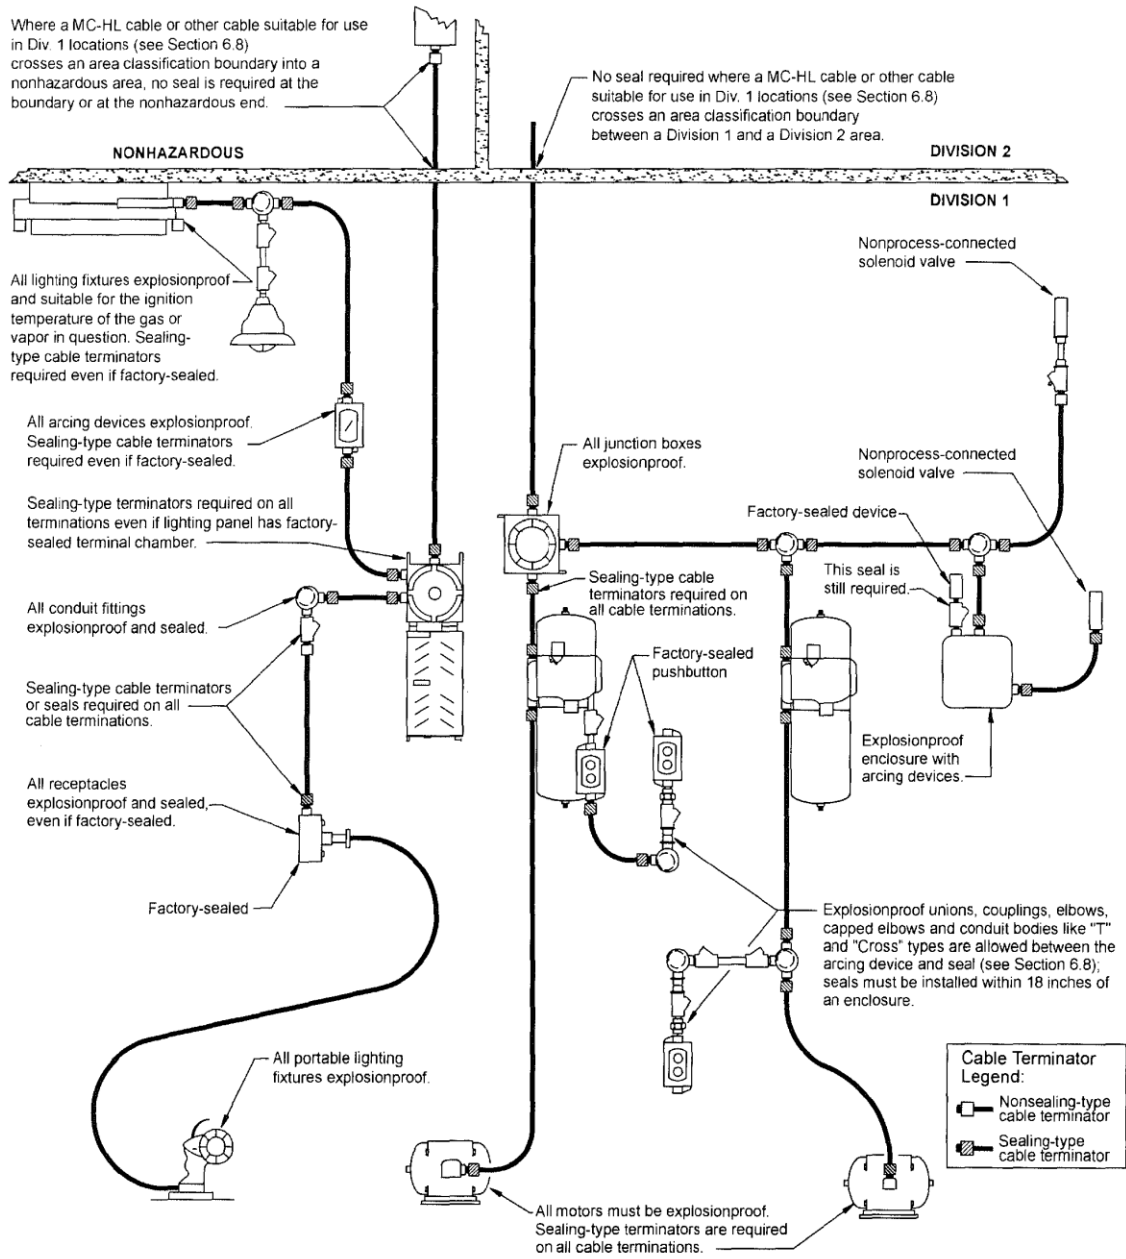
Typical Class 1, Division 1 Electrical Installation Cable System
